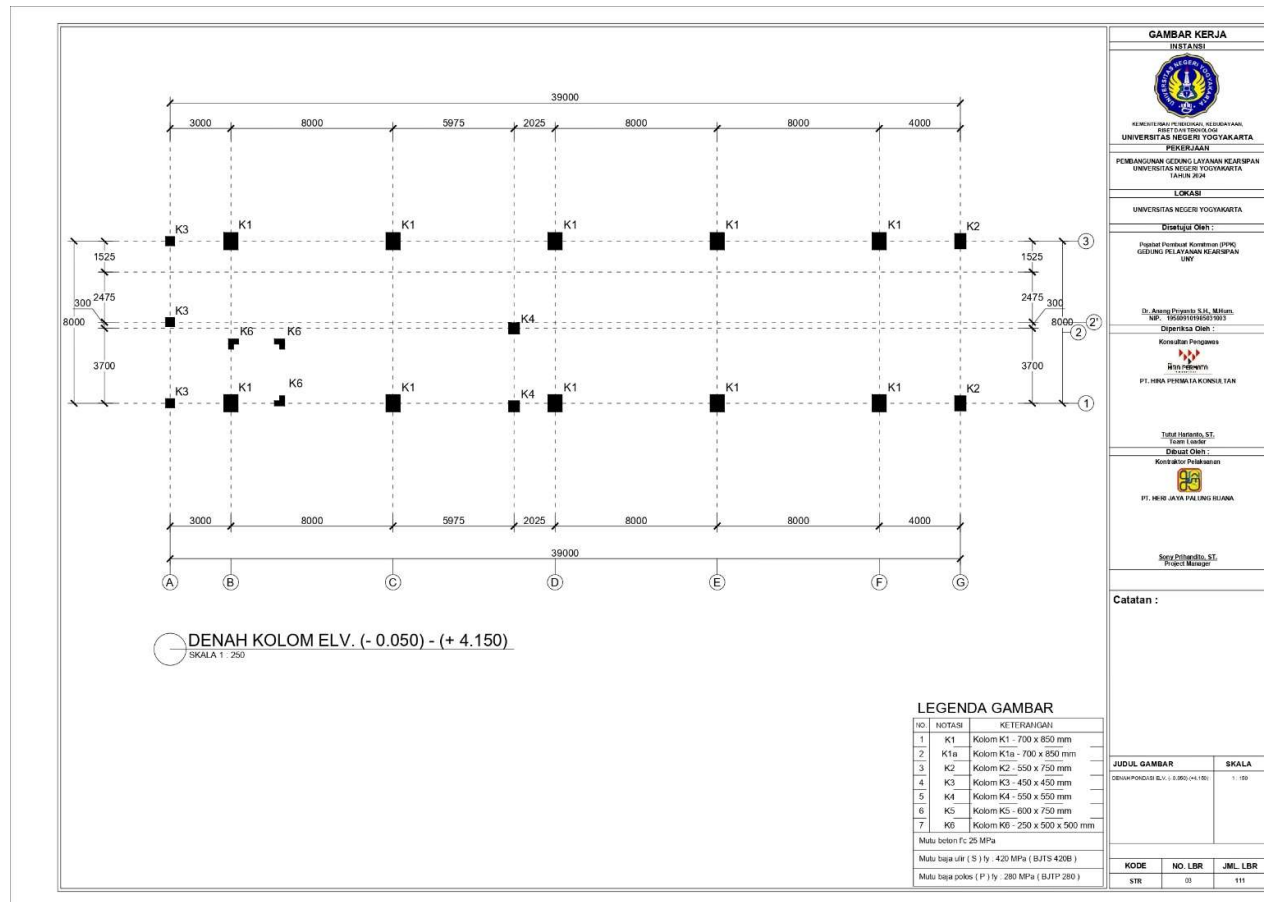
1 Site Plan of Elv. (-0.050) – (+4.150) Column
